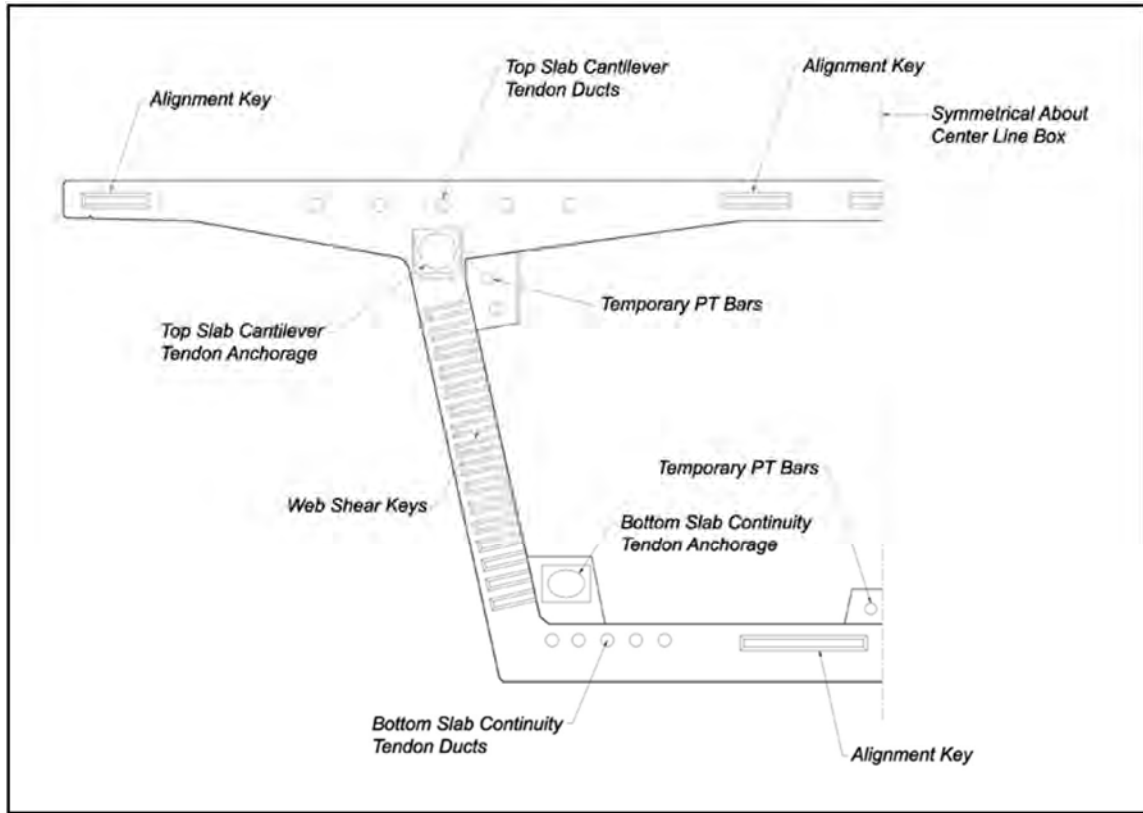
Typical balanced cantilever section (ASBI 2019)
